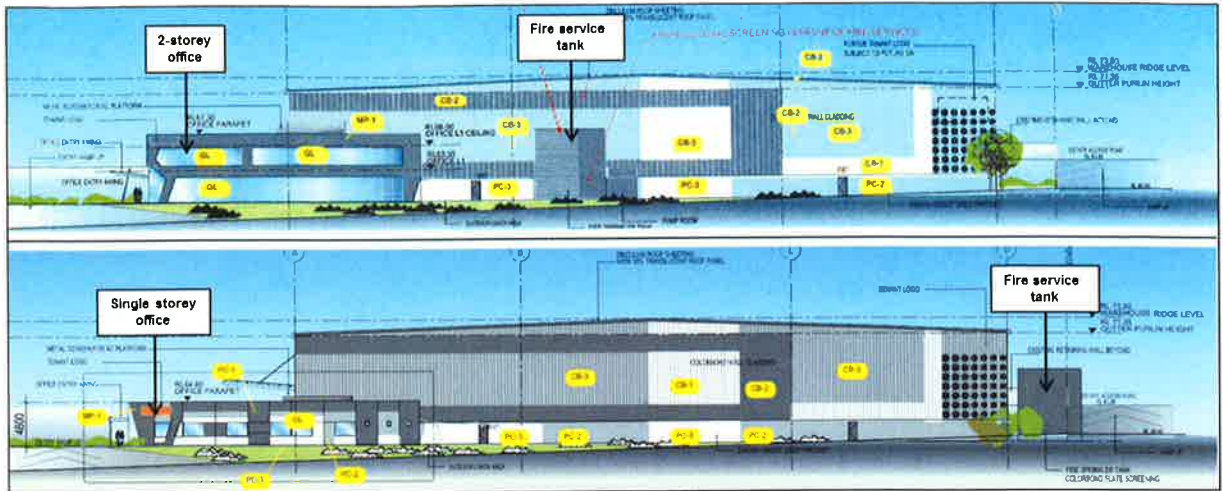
Approved (top) and proposed (bottom) office/warehouse Lenore Drive elevation
